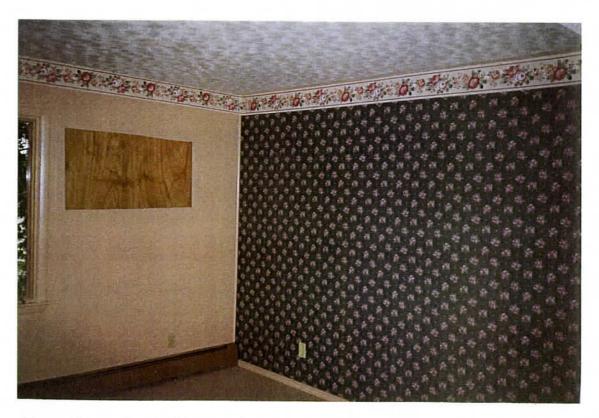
Chamberlain House dining room (Room 108), view looking northeast, May 2001.
